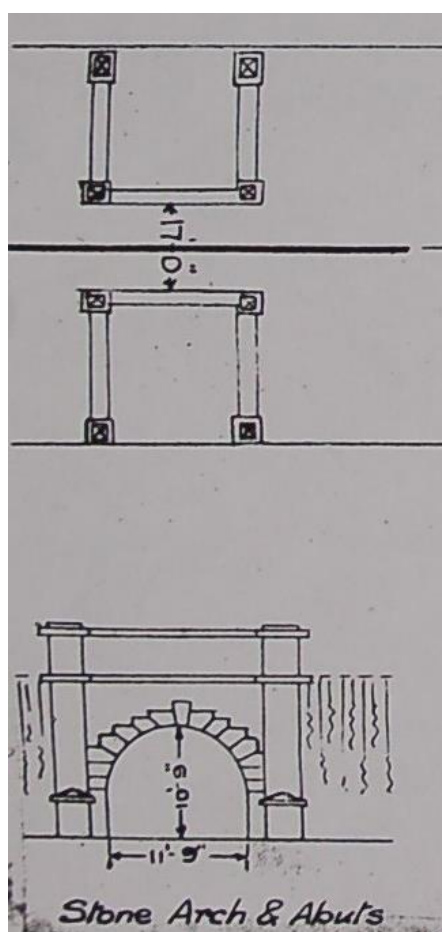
NER track plan sketches dating to 1925 of the elevation of the accommodation arch and a plan showing distance between parapets at 17 feet. (NRM NER Civ Eng DS/14E Box 231). Compare to pl 14.
